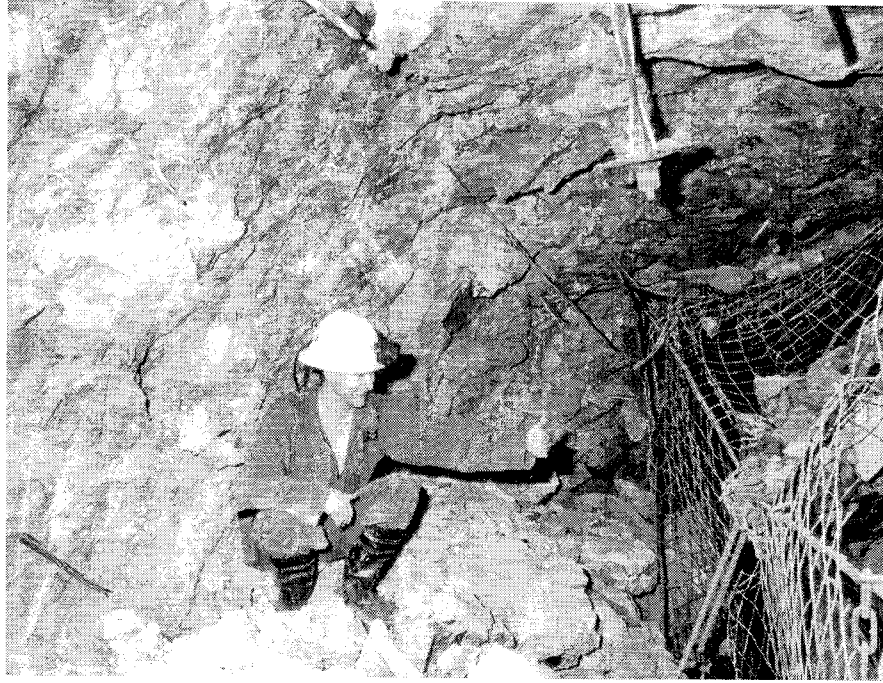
View north east along 42 level haulage showing failure of rock bolt reinforcement (left) and thus loss of fabric anchorage (right) and collapse of approximately 1,5 m of fractured sidewall rock mass.
